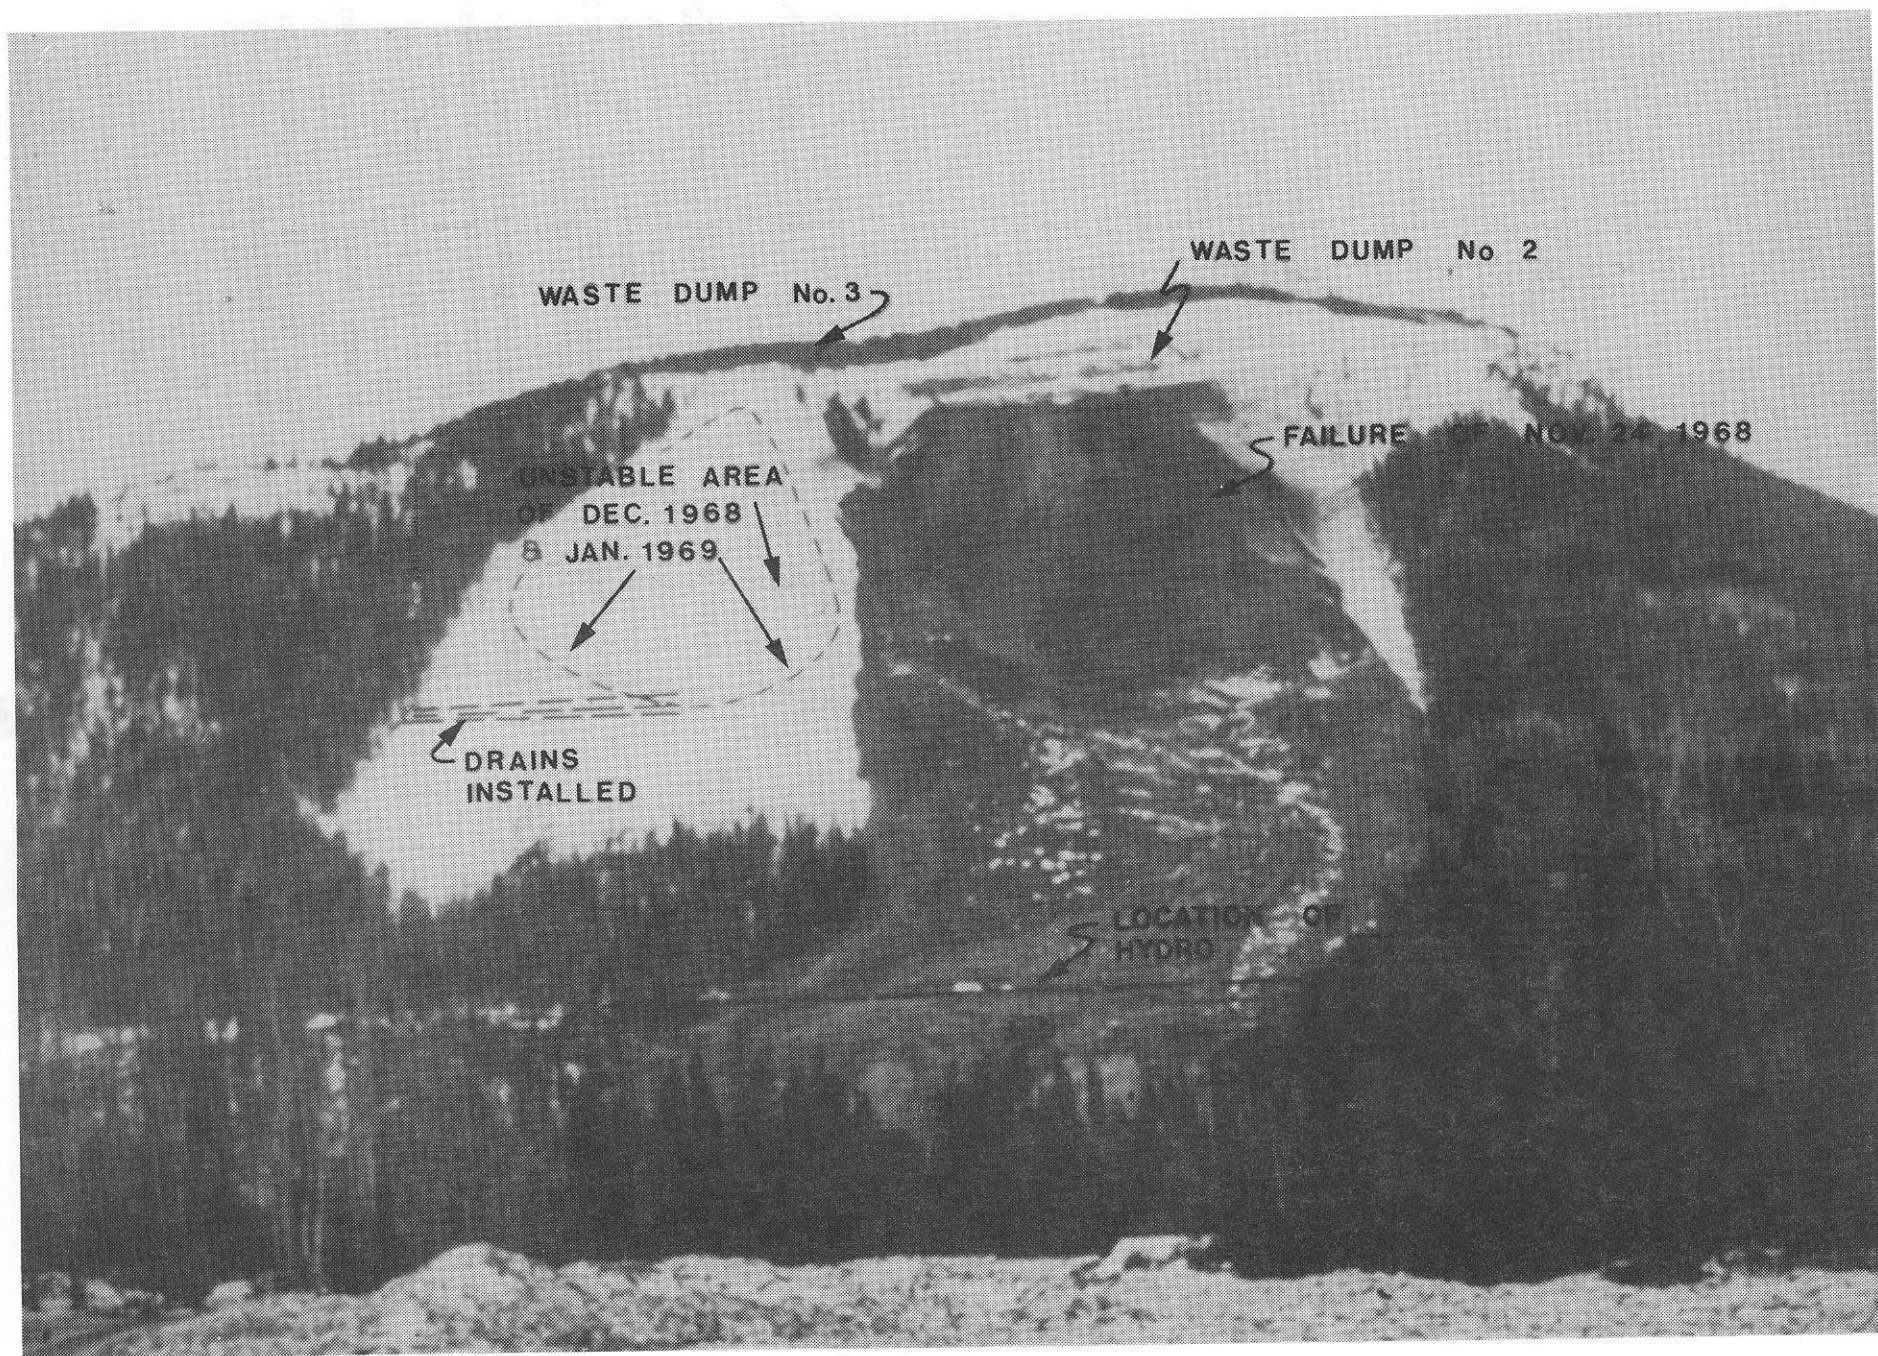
Waste pile that failed at Natal, B.C. in 1968. The pile was about 250 m high and was constructed over a small creek channel. No special channel drainage was developed.
